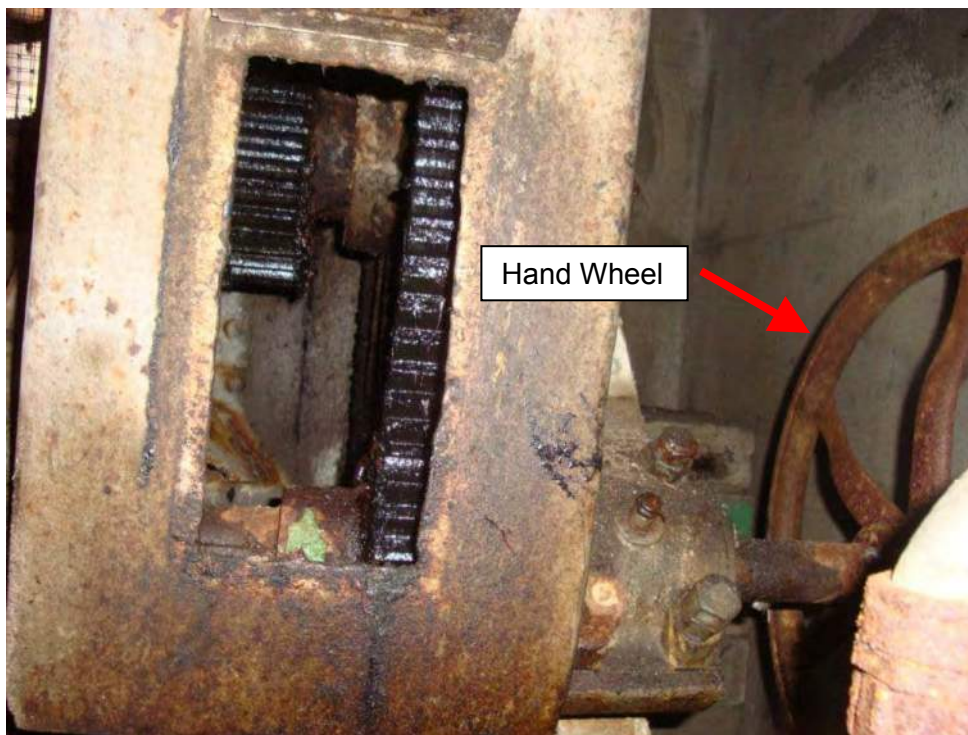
, A hand wheel mounted to the open gearing is uncovered and is a safety hazard. The lubrication of the open gearing appeared dry and contaminated.
